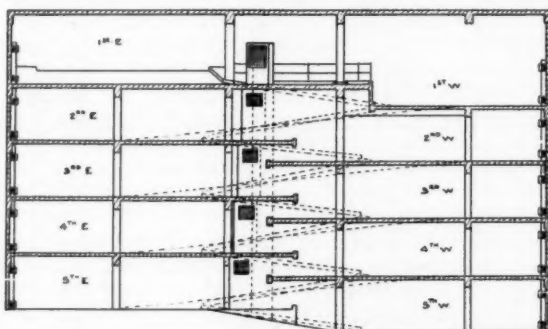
VERTICAL SECTION AA OF GRANT BUILDING GARAGE SHOWING FLOORS AND RAMPS
